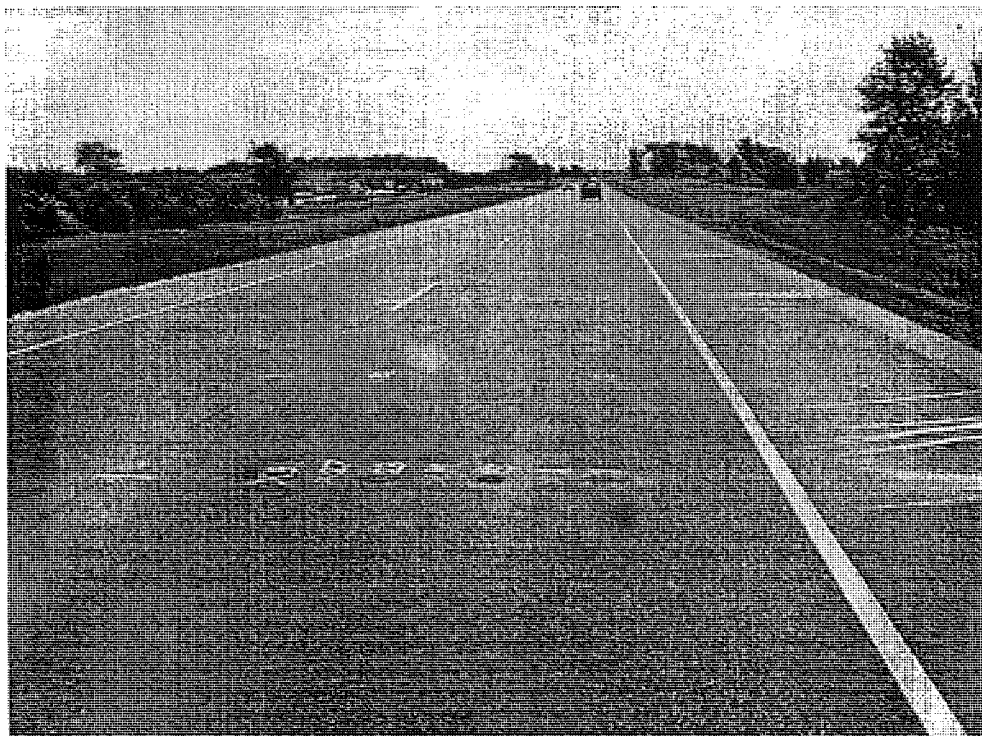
M-37 SB section 5 test site 1 south of Newaygo village
